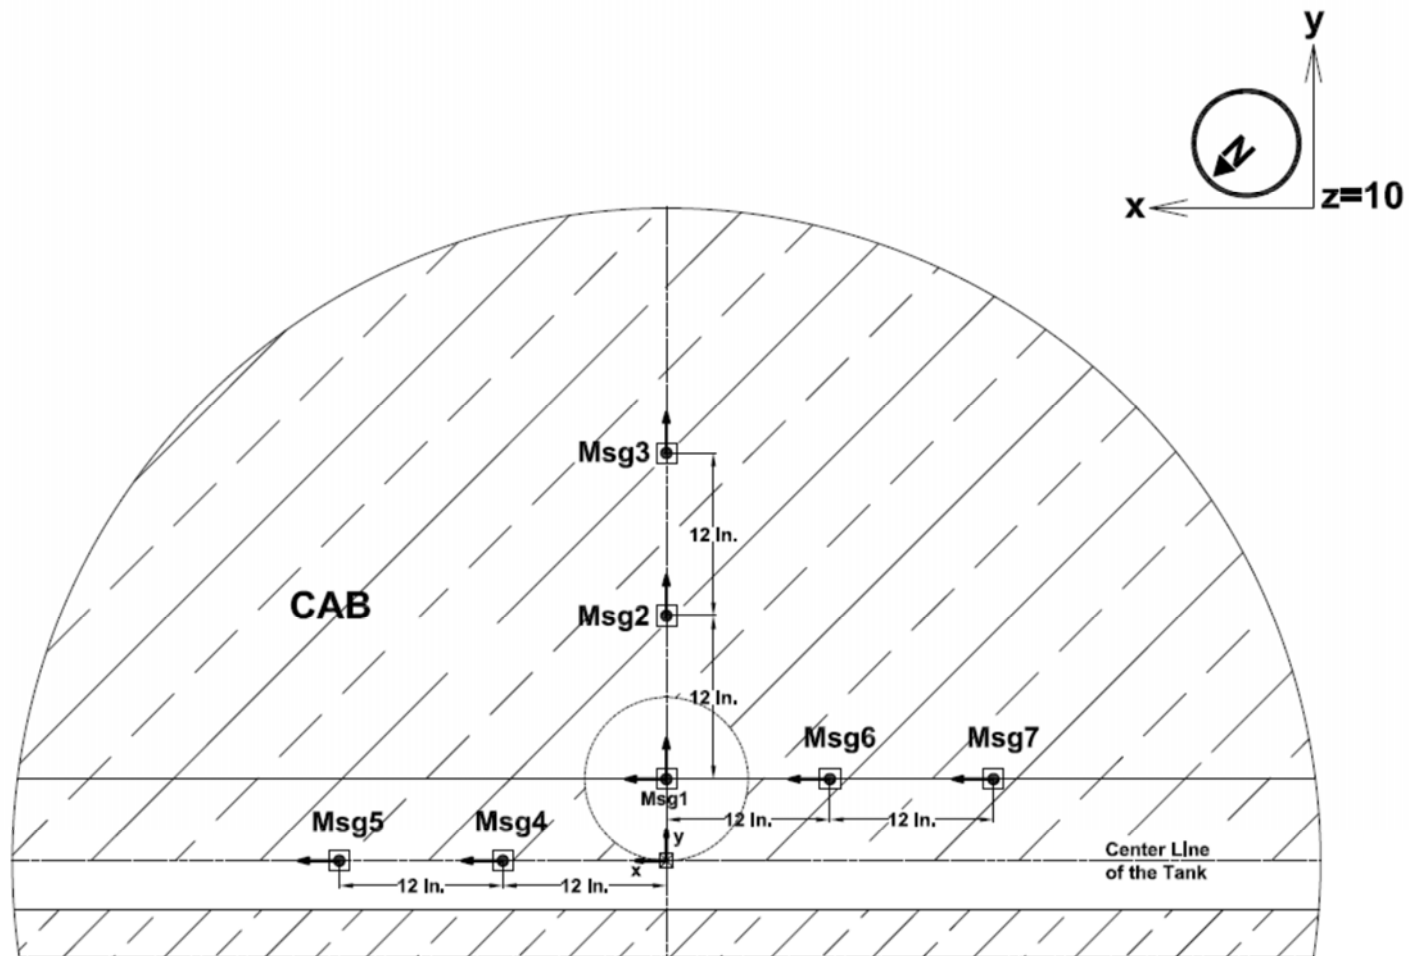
Instrumentation plan for experiment No. 7—Plan view, Z=10 inches
